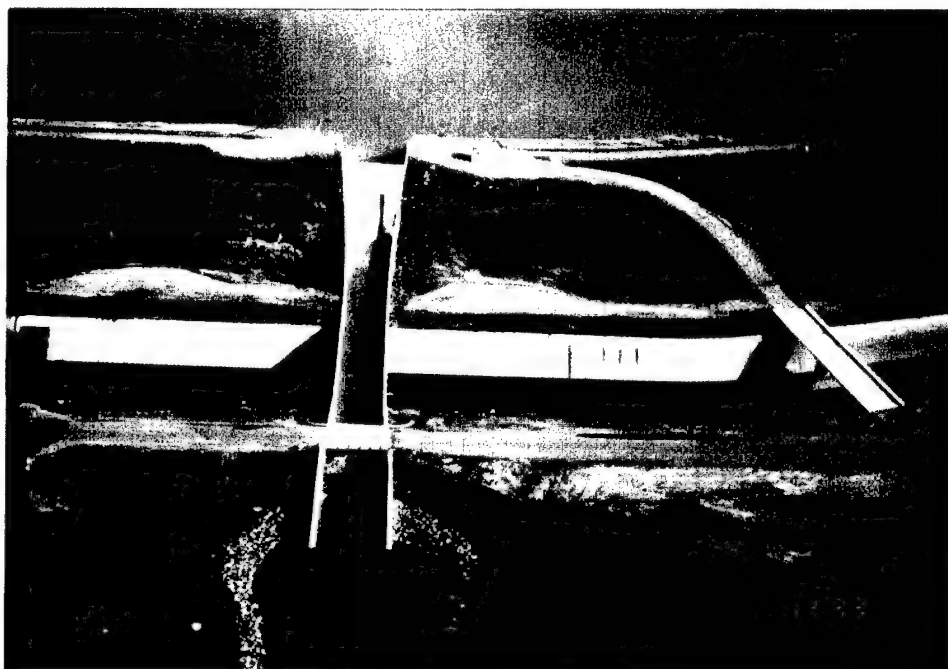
Aerial view of the outlet works/spillway 14 January 1993.
